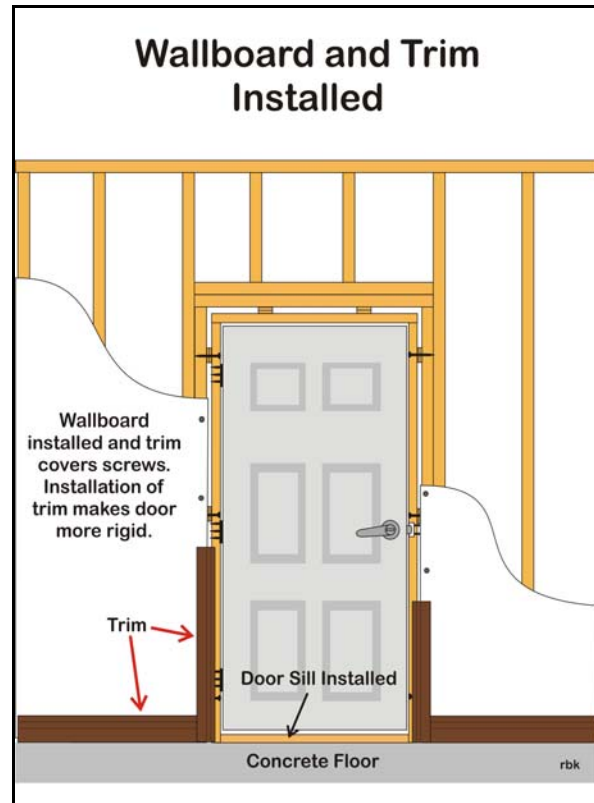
Wallboard and Trim Installed – Nailing the trim stiffens up the door. From a security standpoint the typical door installation is designed to prevent an intrusion. Source: author – [file:\SH-DoorConstruction02.cdr].
